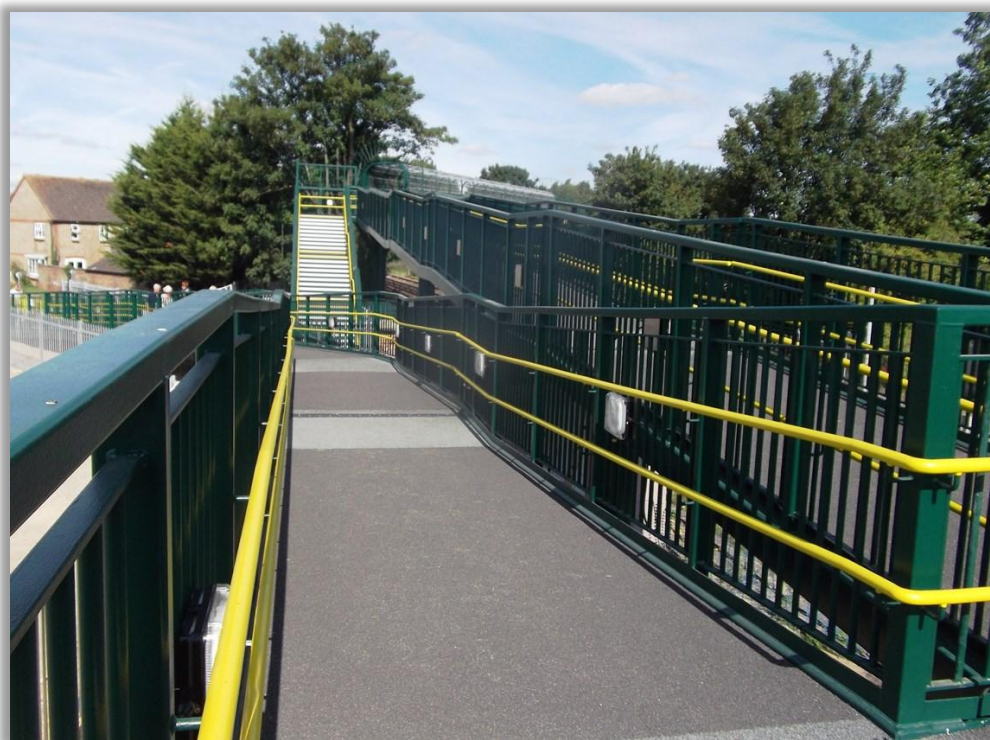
Solent Retail Park bridge as example of Vierendeel girder span
